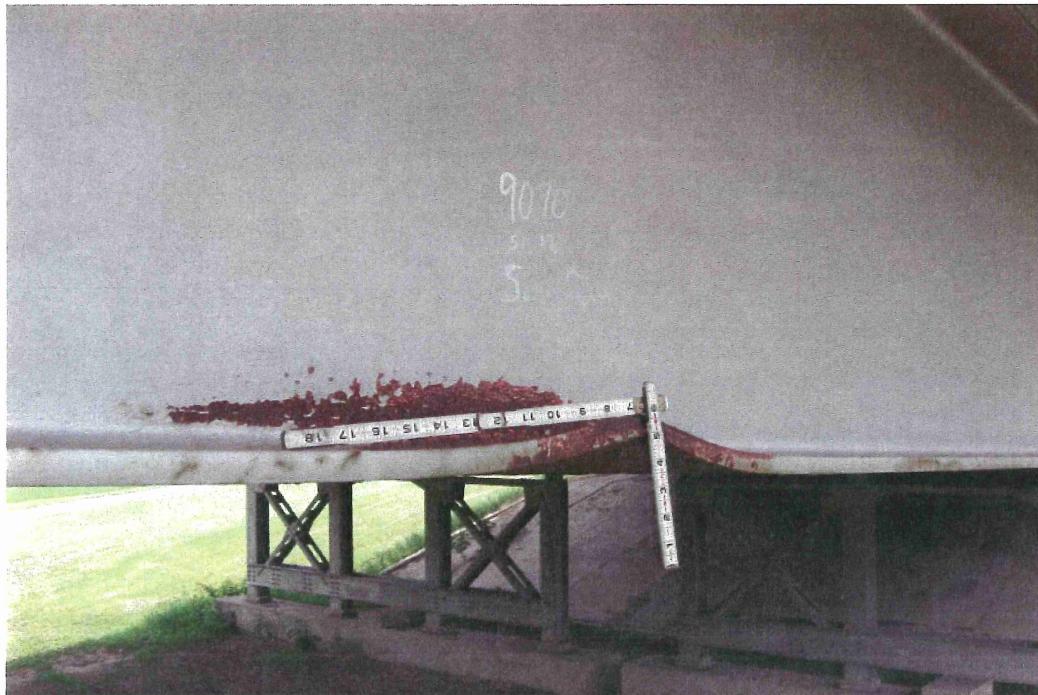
Span 12, south fascia, impact damage to bottom flange. Bottom flange has been bent upward 2". Looking northeast.
